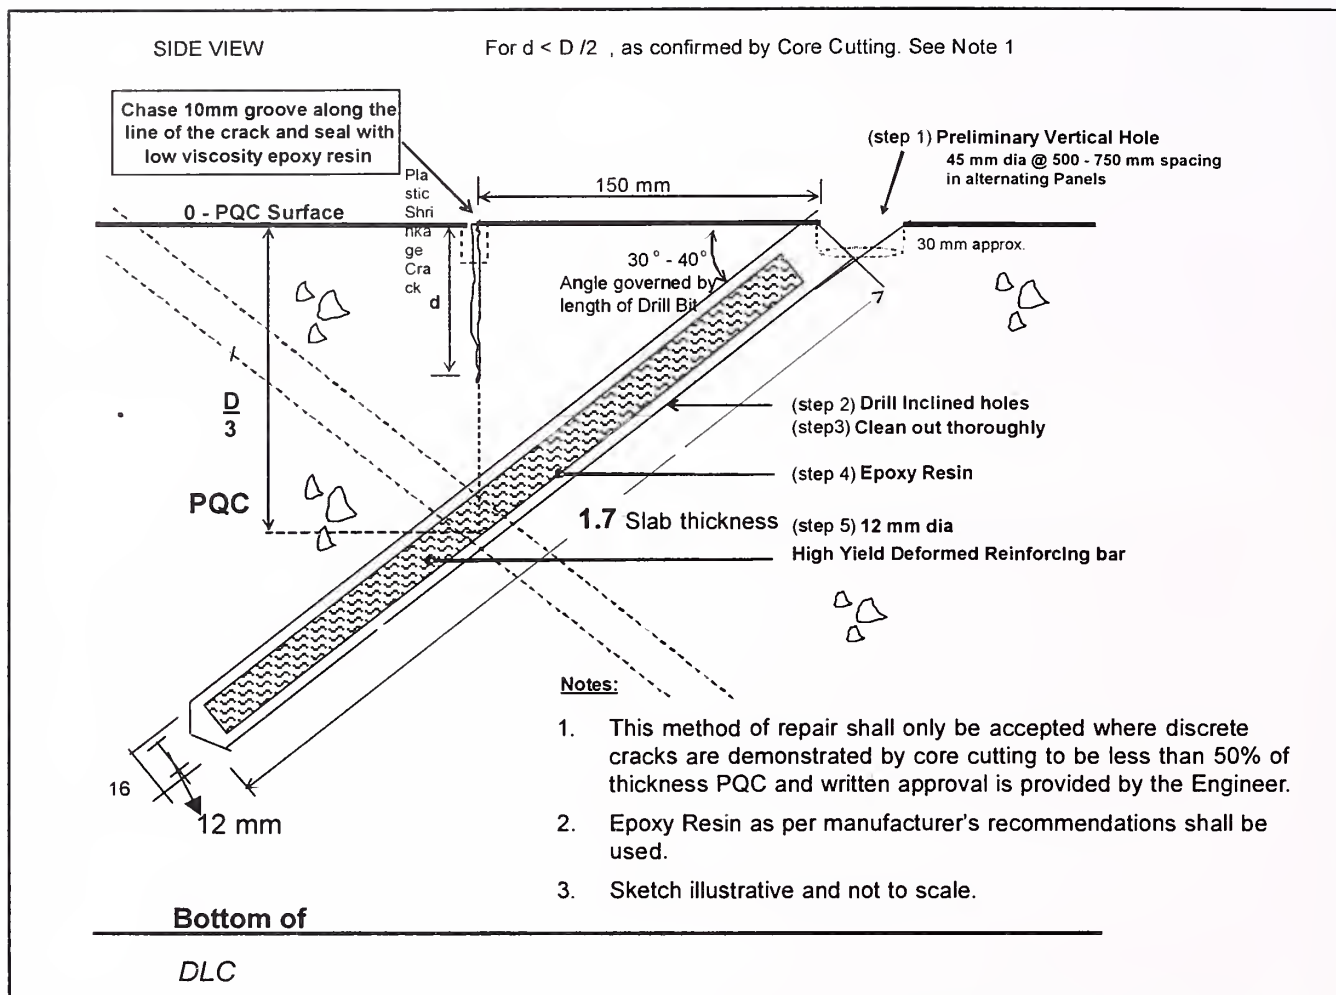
Typical Arrangement for Cross-stitching with 12 mm. dia Straight bar
